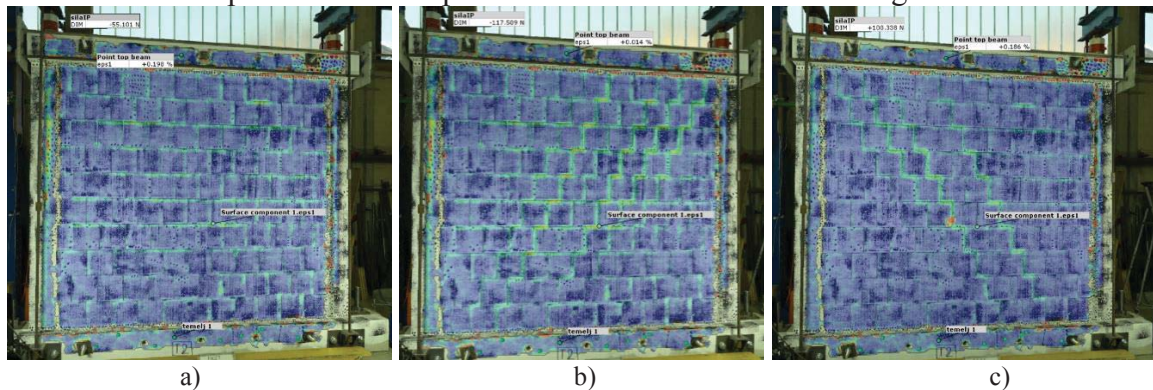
Surface plot of the wall strains of specimen T2 at drift levels of 0.012 % (a); 0.11% when moving the wall from right to left (b); and 0.11% when moving the wall from left to right (c)
